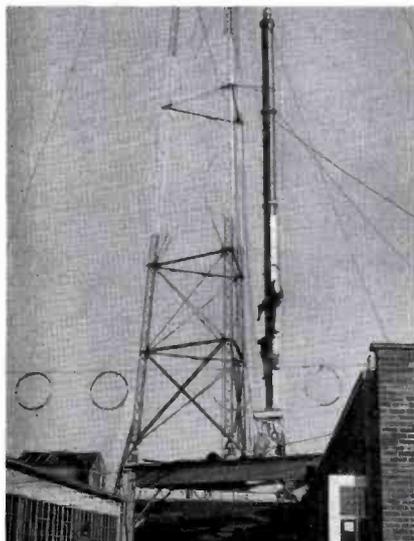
Four-section Pylon completely assembled is shown here ready to be hoisted up the tower.
